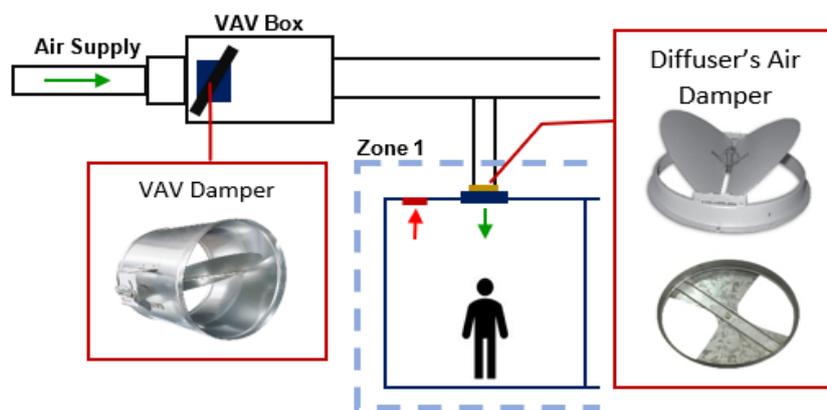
Type of dampers in the ventilation system consists of zone damper (VAV damper) and diffuser's air damper
